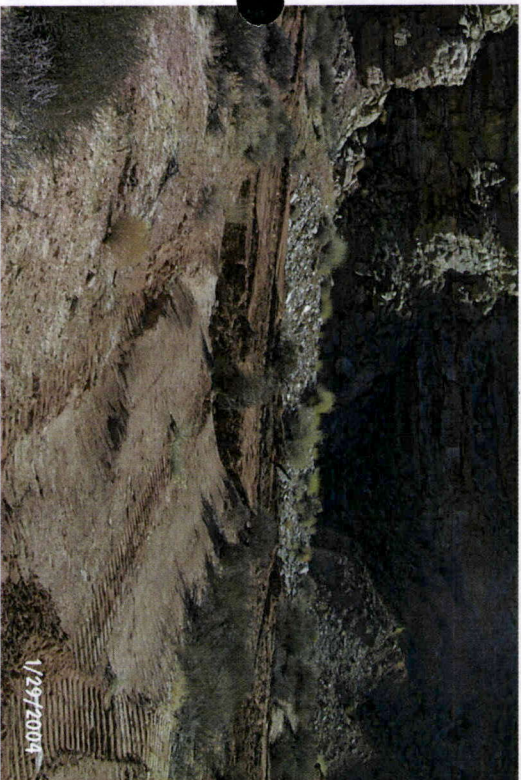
Near the center of this picture is a berm that directs water away from the road leading to the escapeway.
